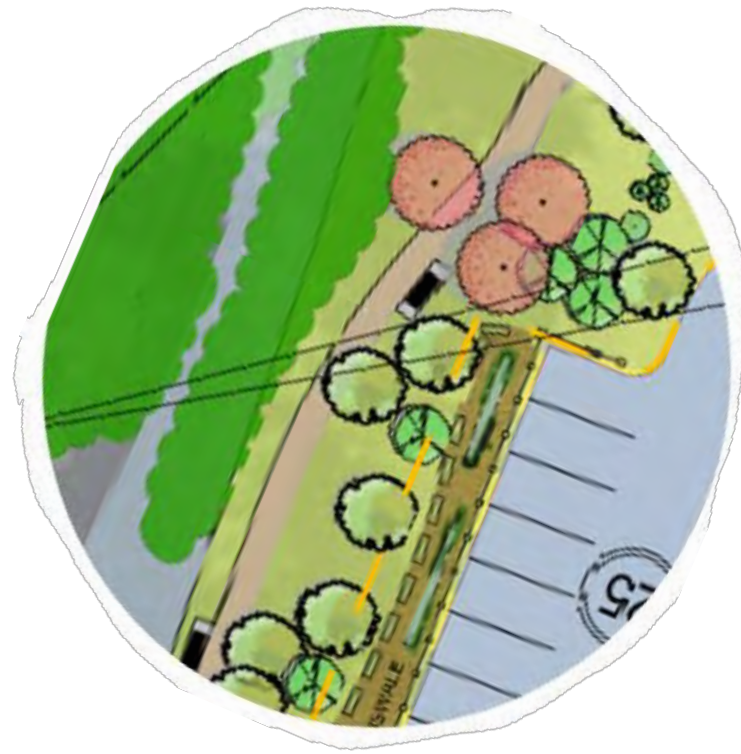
Excerpt showing an accessible path from the proposed Concept Plans.
